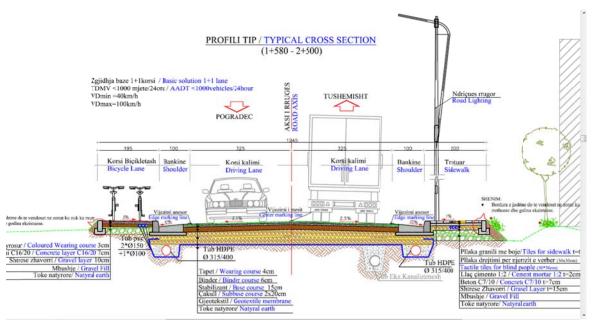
Existing infrastructure situation in non-urban area of the segment and proposed cross-section
